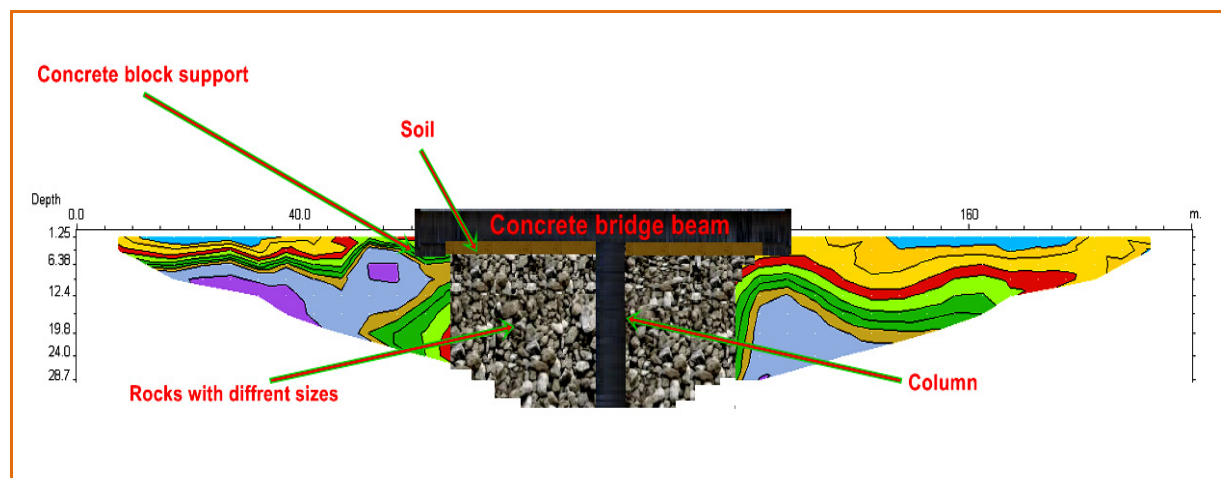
Sinkhole remediation by employing concrete bridge beam in order to transfer the load of constructions to the both sides of the massive sinkhole
